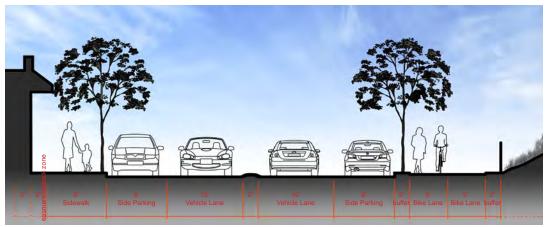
Section-elevation of central sections of SBR within the project site with 10' vehicle lanes.
